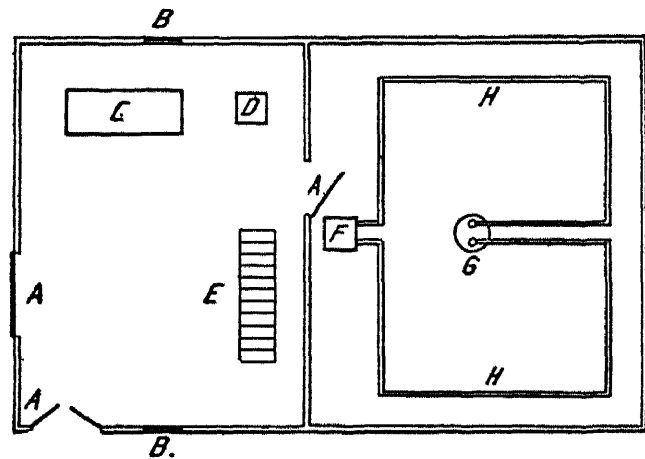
First-floor Plan of an Evaporator, showing the arrangement of the principal details. A, doors; B, windows; C, paring table; D, bleacher; E, stairs; F, chimney; G, furnace; H, pipes.
